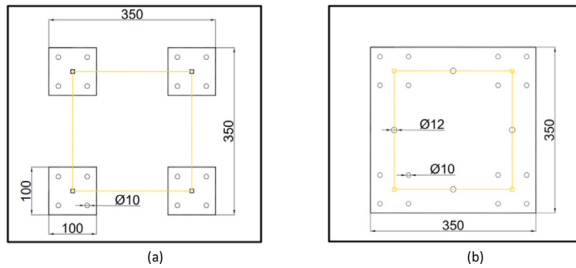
(a) Bottom floor plan view (b) Bottom plate.
